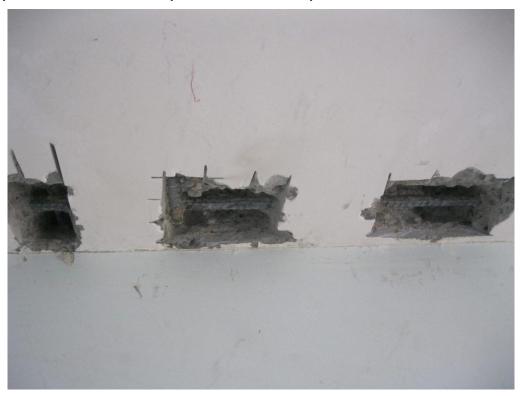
Further opening up of the suspended slab showed the steel reinforcement cage not to be tied into precast wall from the top.
